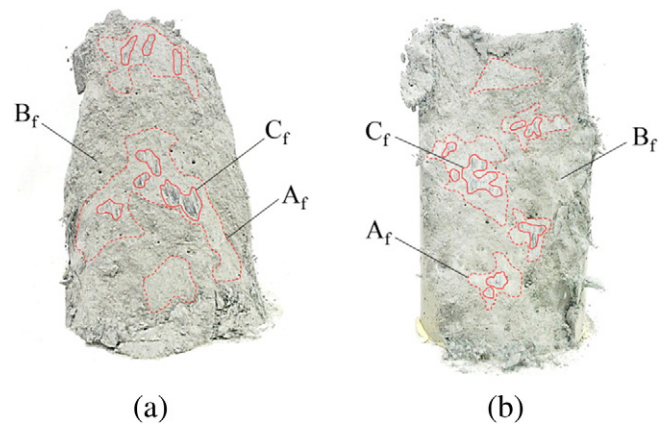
Fatigue failure surface of UHTCC specimens.
